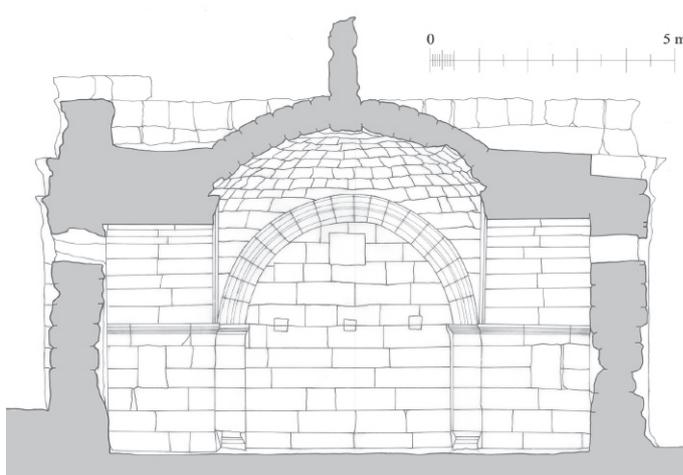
Amman, Nuweijis, section looking from the southeast to the northwest
